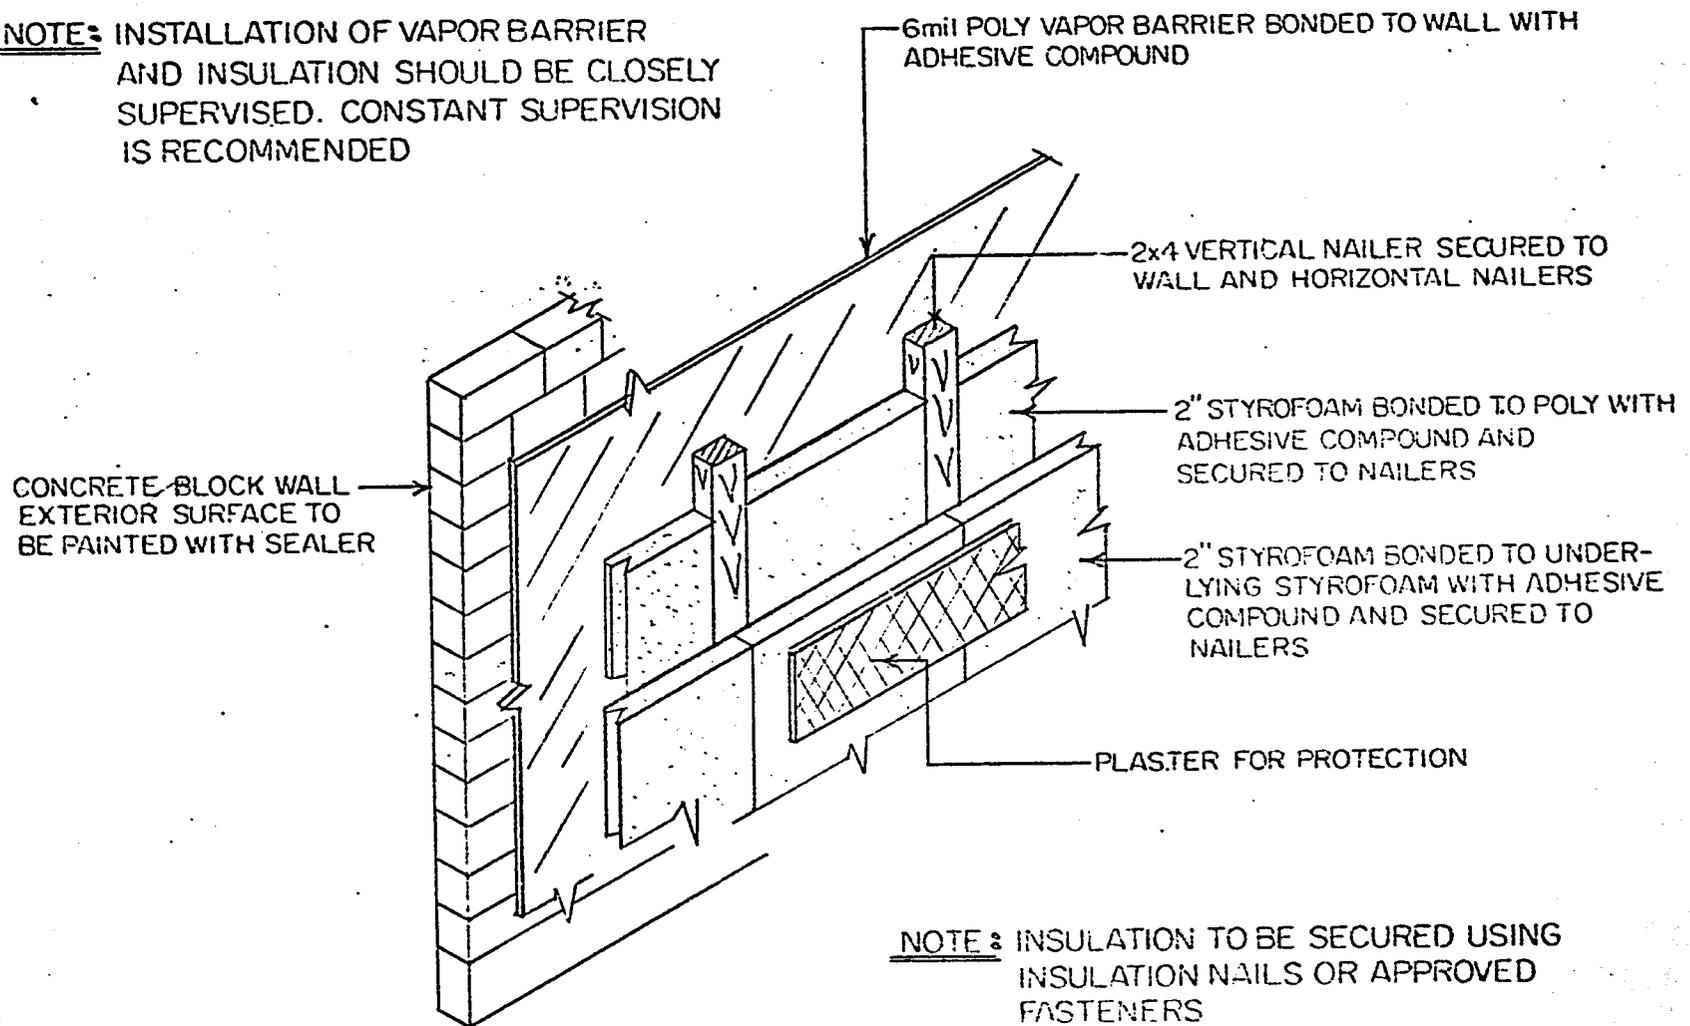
Details of vapor barrier and insulation installation (David and Divisa).
